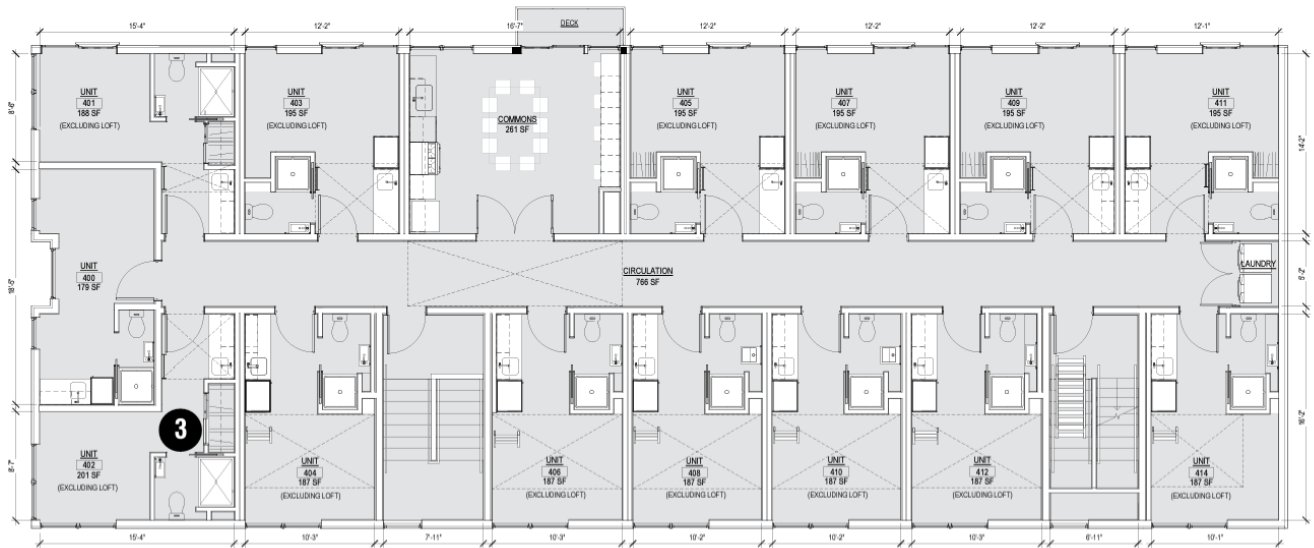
Karsti apartment building floor plan. Credit Neiman Taber Architects.
